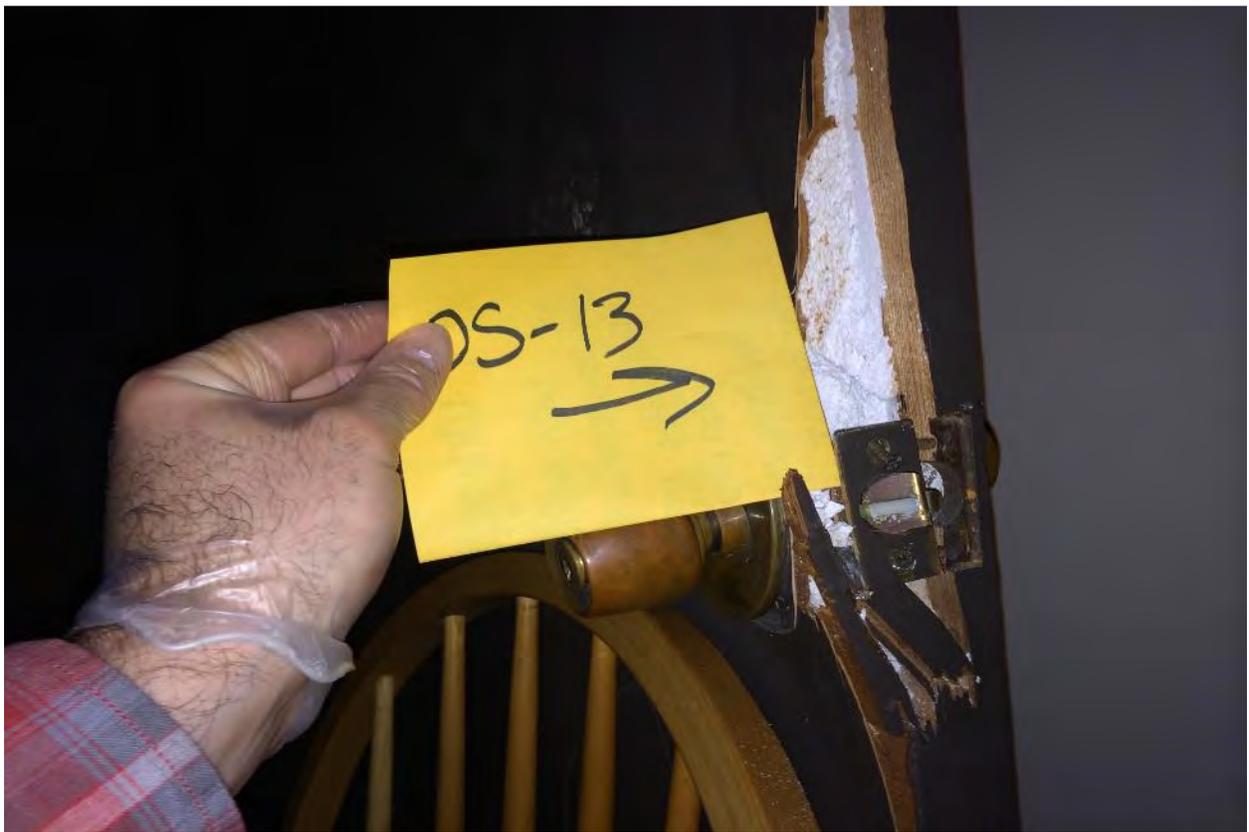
Laboratory analyses detected 60% chrysotile asbestos and 30% amosite asbestos within central room fire door sample DS-13 collected from the Dormitory Building central room door.
